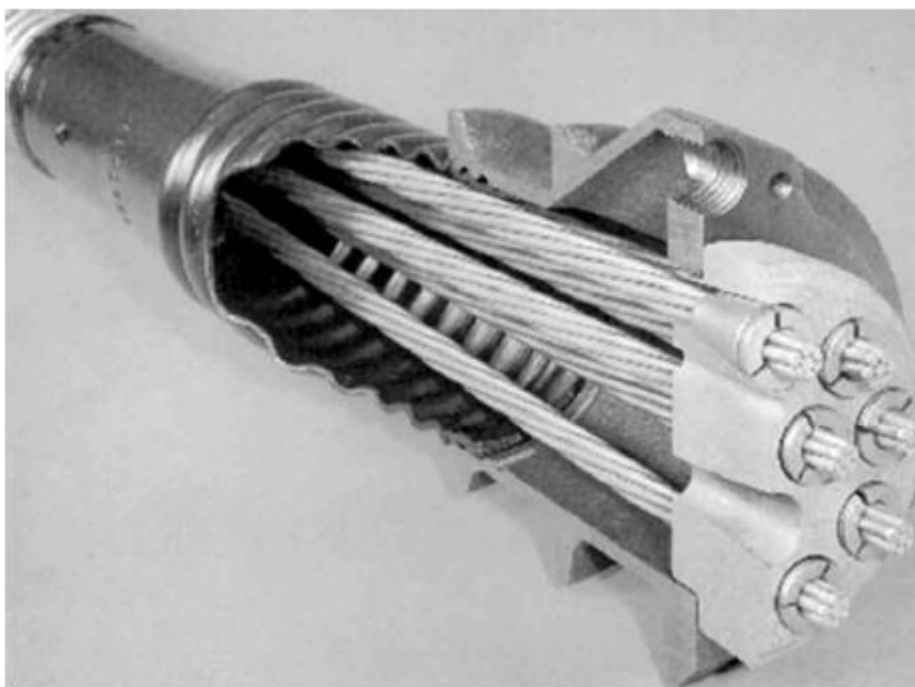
Anchorage provide for the safe introduction of post-tensioning forces into the concrete.
